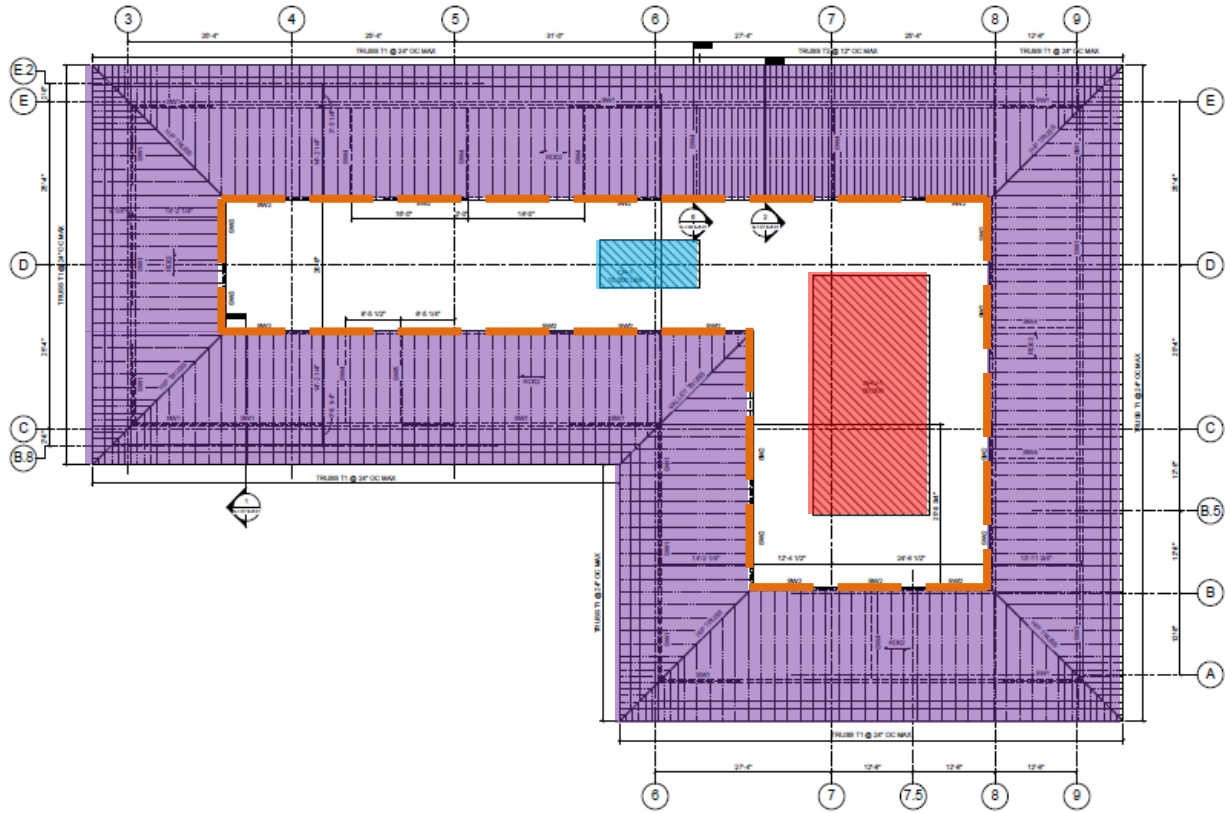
Upper Roof Framing Plan Showing Pre-engineered Trusses (Sheet S-1.08)
